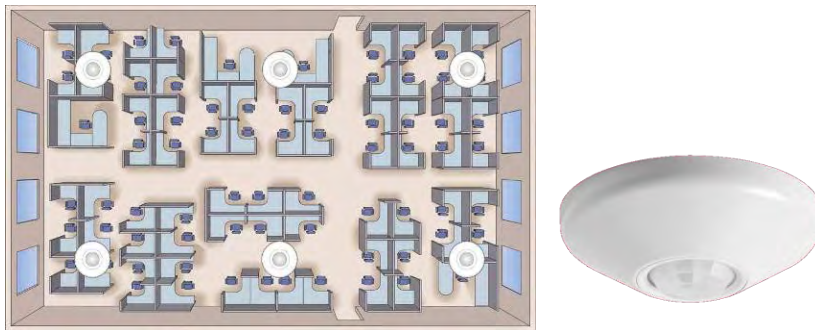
Typical open-space ceiling-mounted sensor application and coverage
